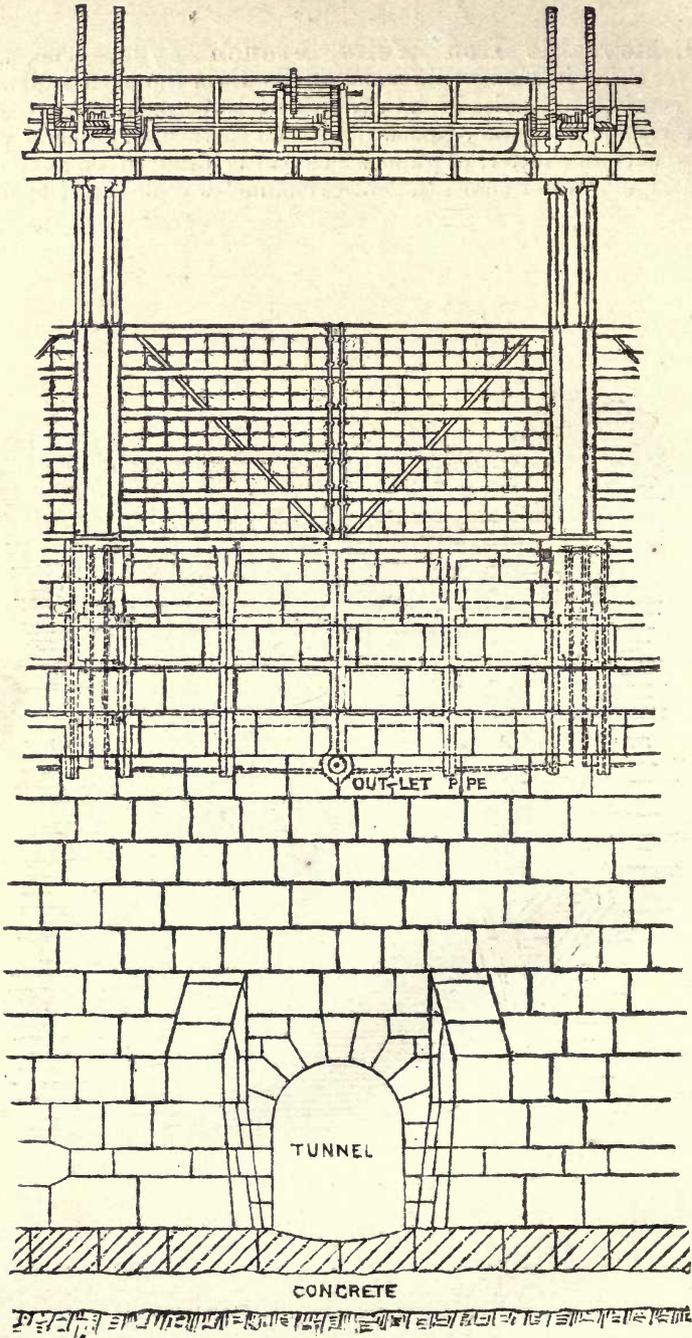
Goulburn Masonry Weir. Down stream Elevation.
